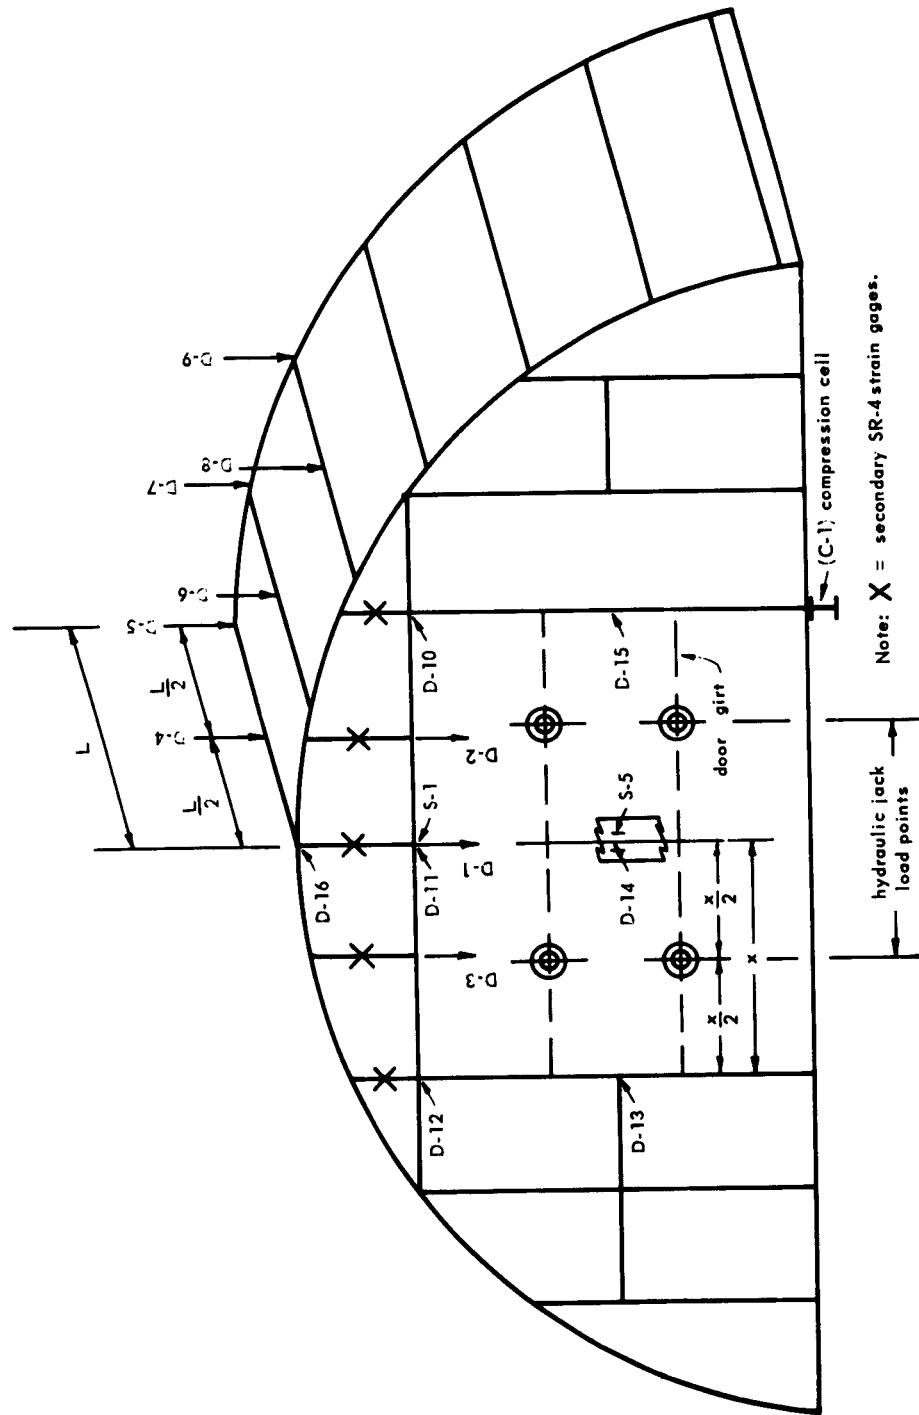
A sketch of endwall framing showing load and instrumentation stations.
